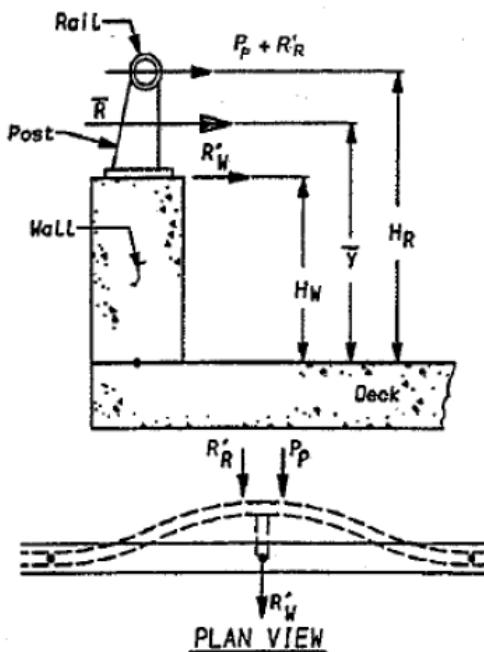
Concrete Wall and Metal Rail Evaluation—Impact at Post.
